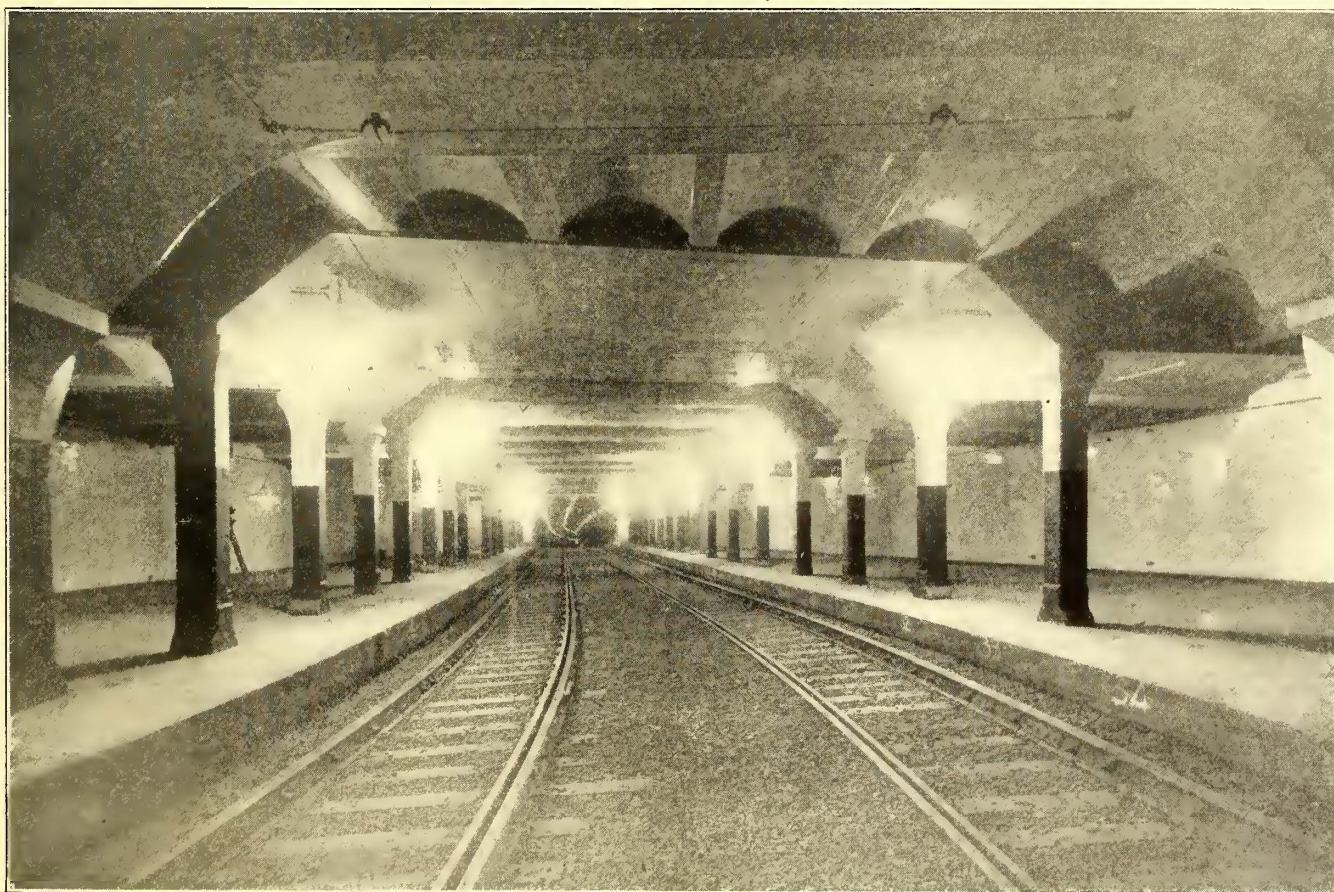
EAST BOSTON TUNNEL, DEVONSHIRE STREET STATION
